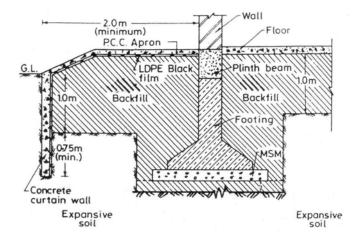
Typical arrangement of apron, LDPE film and curtain wall alongwith footing.
